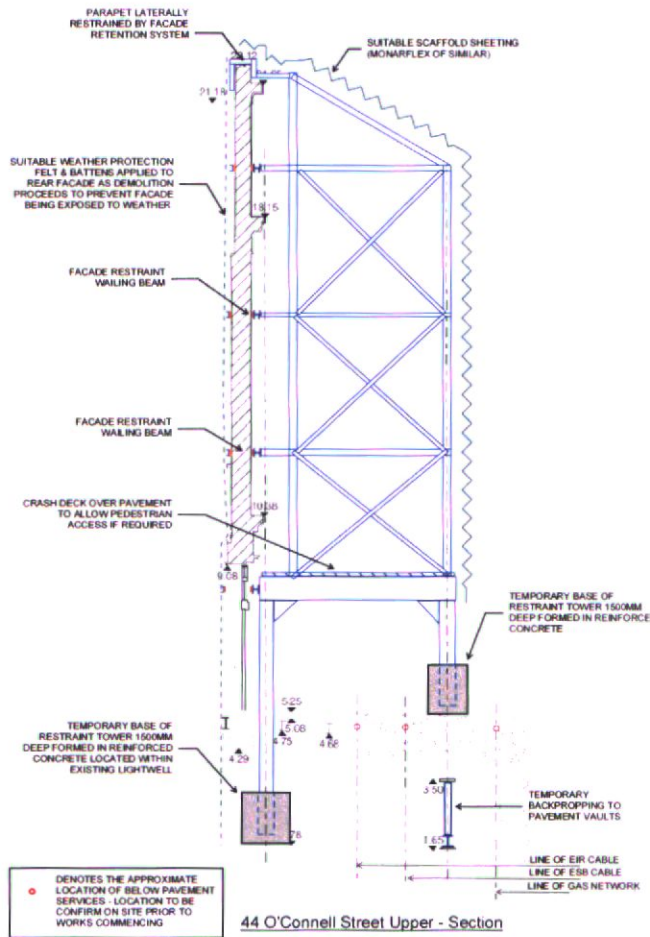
43-45 O'Connell Street Upper (Section – Typical Façade Restraint System)
